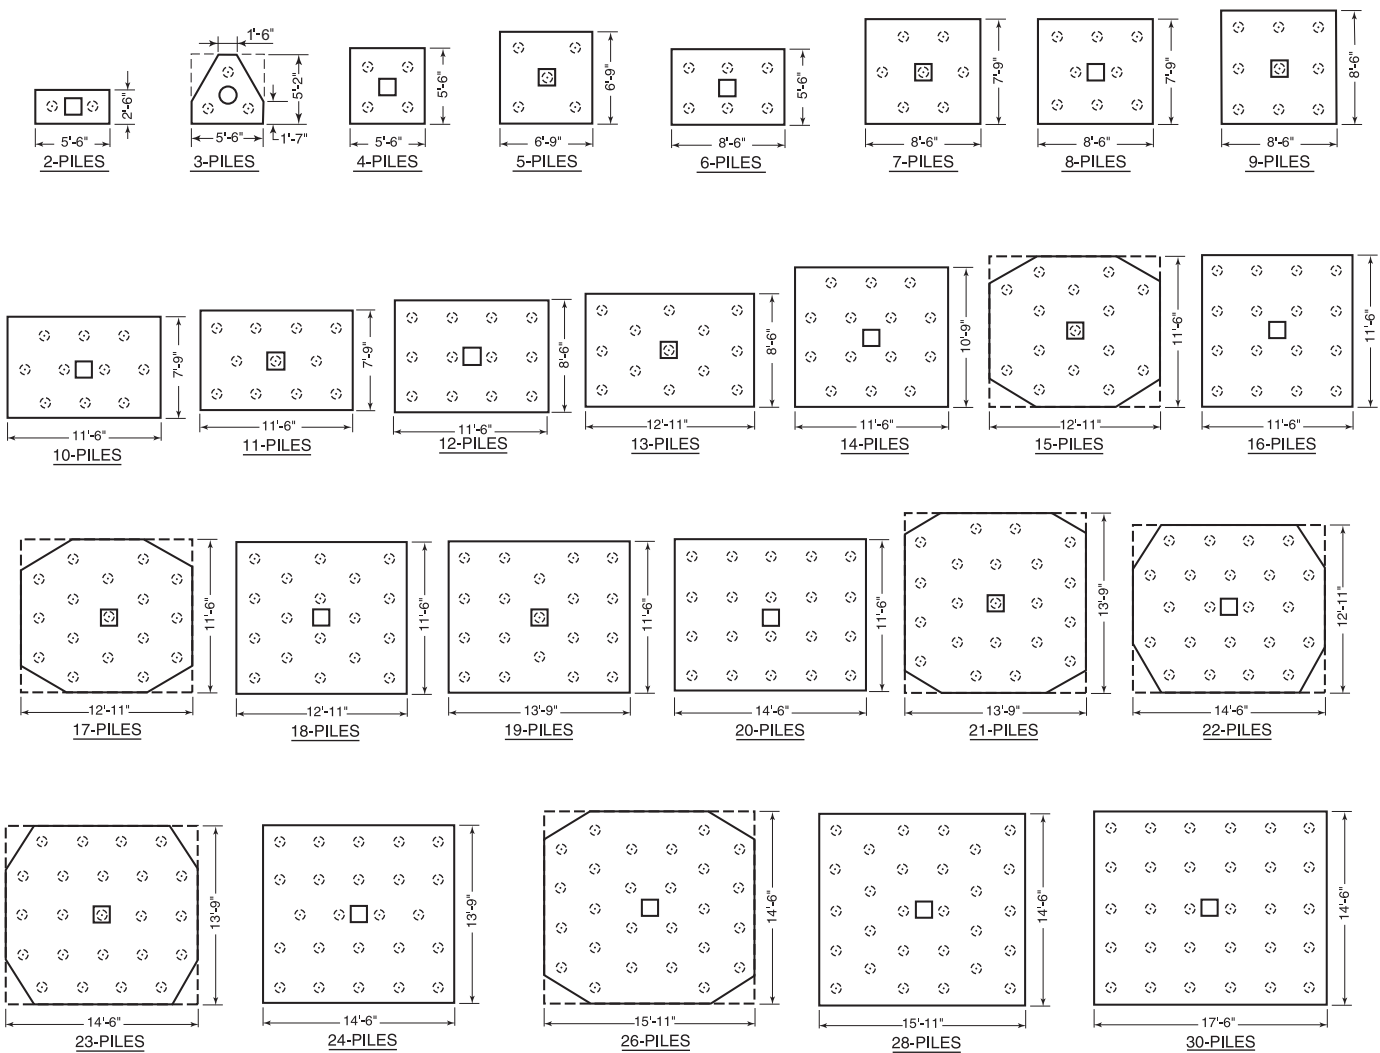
Arrangement of piles and minimum plan dimensions of pile caps.
